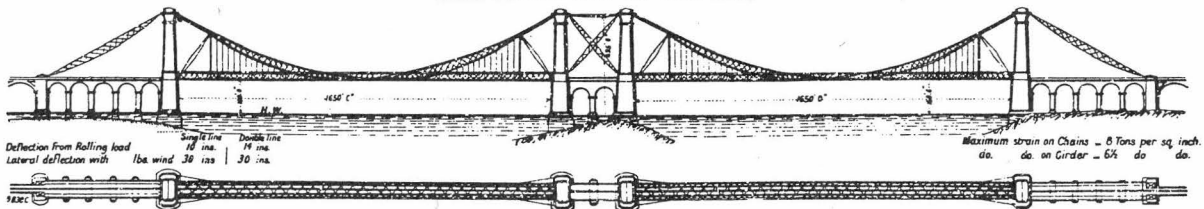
TYPE 1. SUSPENSION BRIDGE WITH STIFFENING GIRDER.
